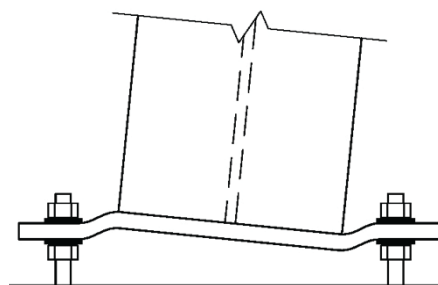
Failure mode 2: bending failure of base plate.
